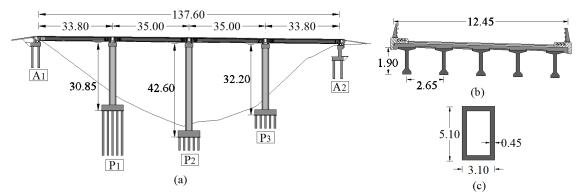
The "reference" bridge (a) Longitudinal section, (b) Cross –section of the deck and (c) Cross – section of the piers
